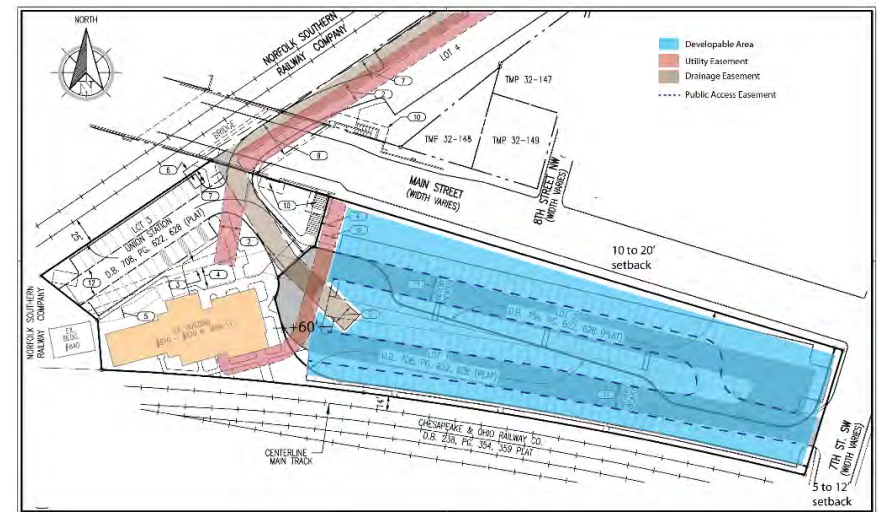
Amtrak Building and Parking Lot Site Plan - Development potential. A full-size version of this map is provided in Appendix A.
